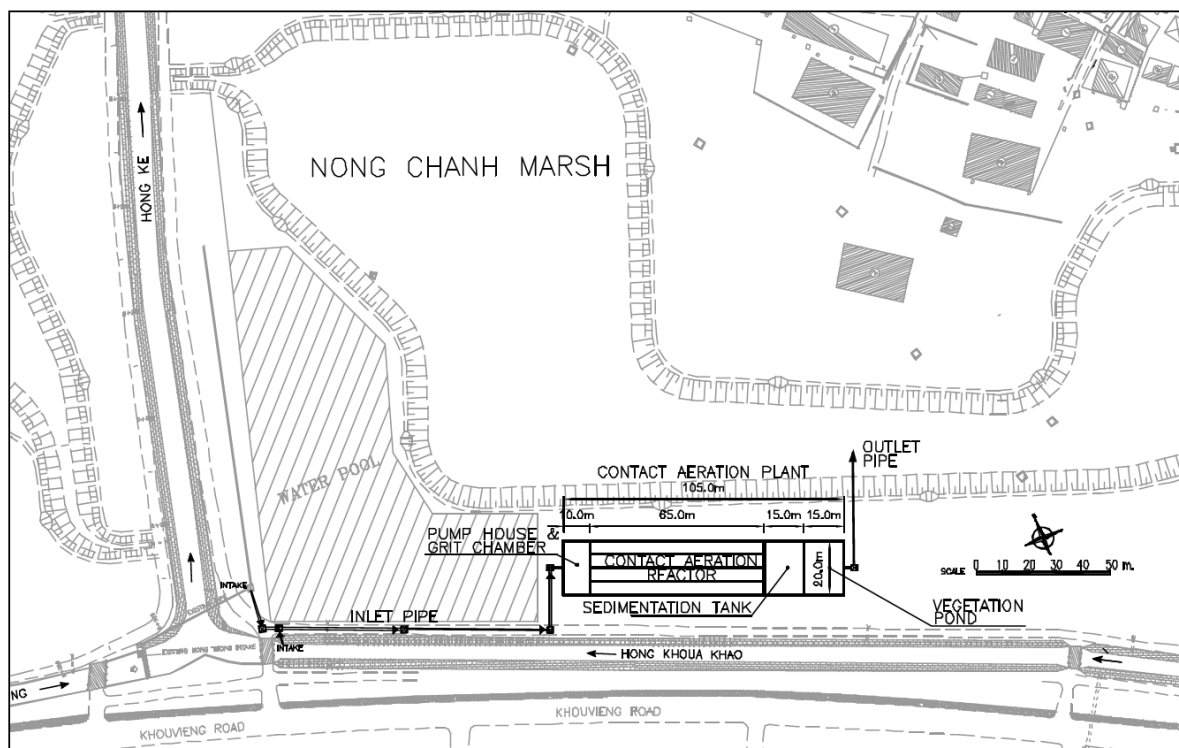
Plan of Contact Aeration Plant for Canal at Nong Chanh Marsh
